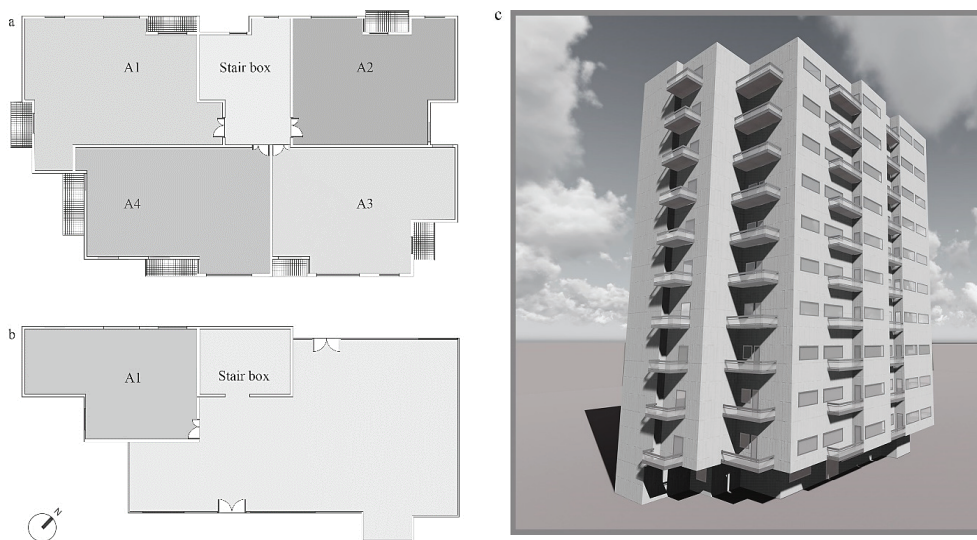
Architectural plans of RC with defined thermal zones and an isometric view. (a) Typical floor; (b) ground floor; (c) isometric view.
